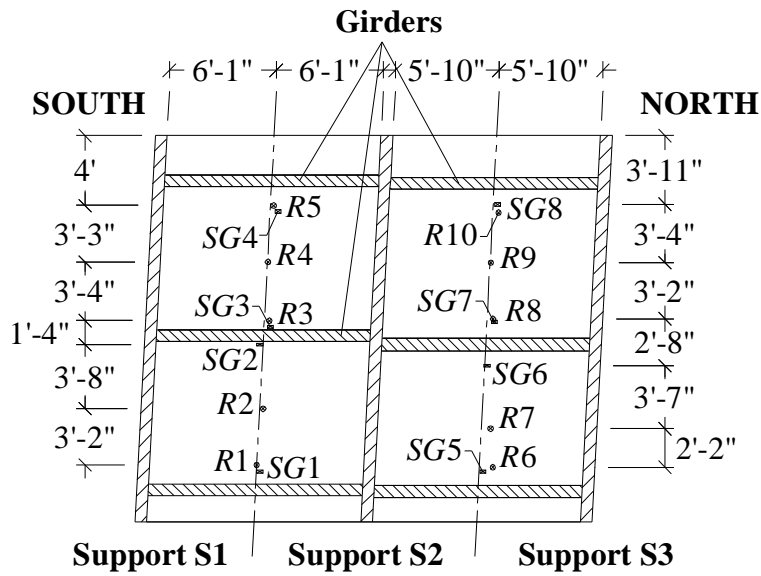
LVDT and Strain Gage Positions in the Load Test after Strengthening
